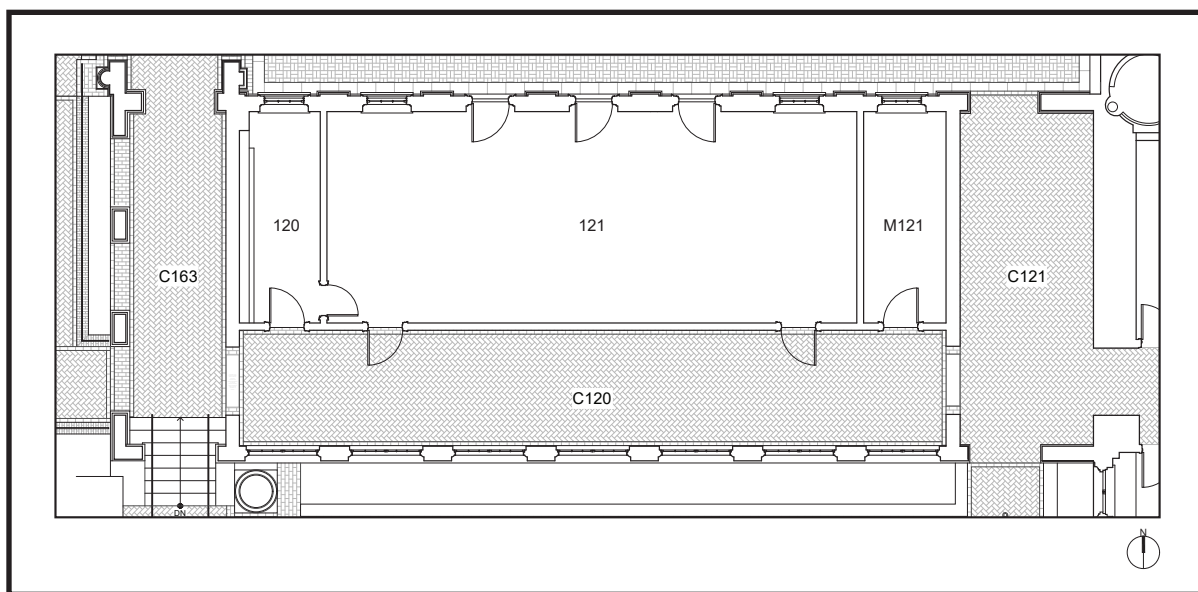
Detail, ground-floor plan of the southwest wing (not to scale).
